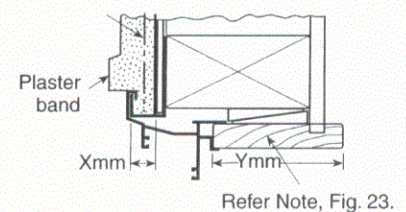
ALTERNATIVE FLUSH JAMB DETAIL
